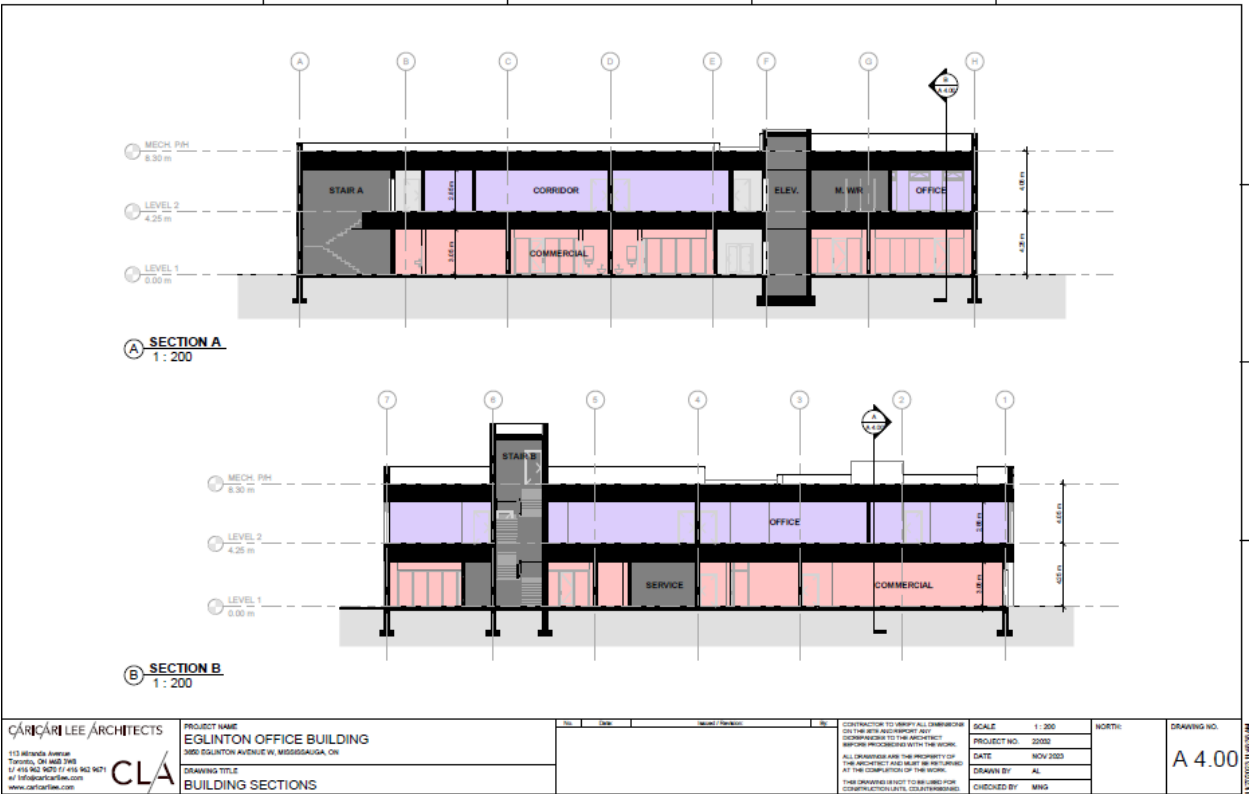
Office Building Sections. (Plan from Owner, November 2023.)
